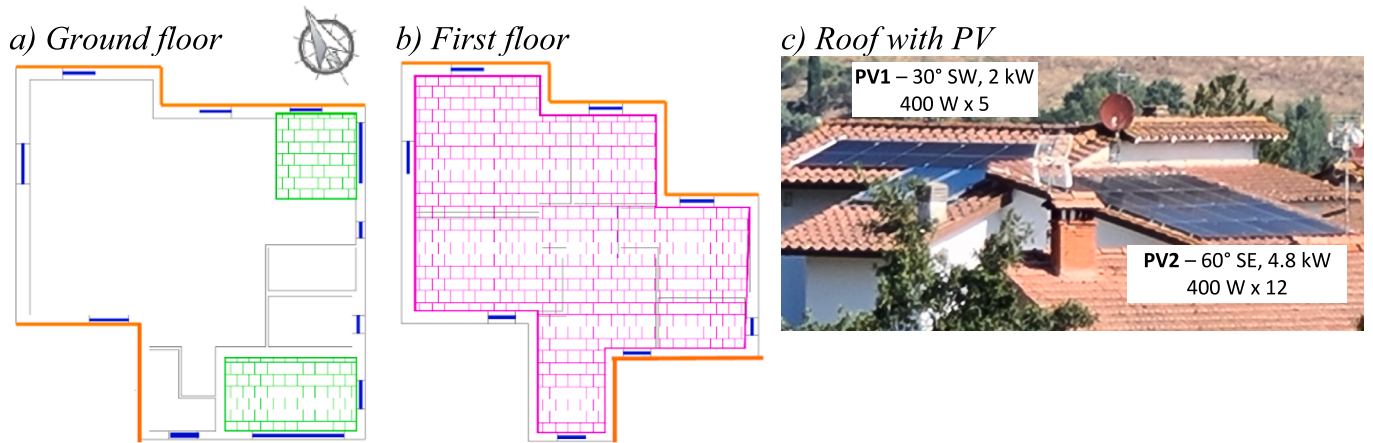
Schematic of building plans, insulation interventions and roof with pv.
